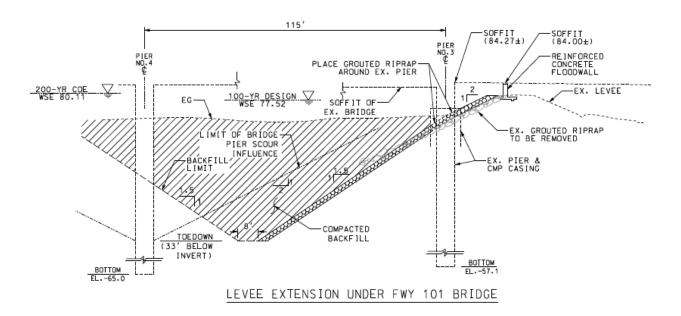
Typical Cross Section of Levee/Floodwall under Hwy 101 Bridge
